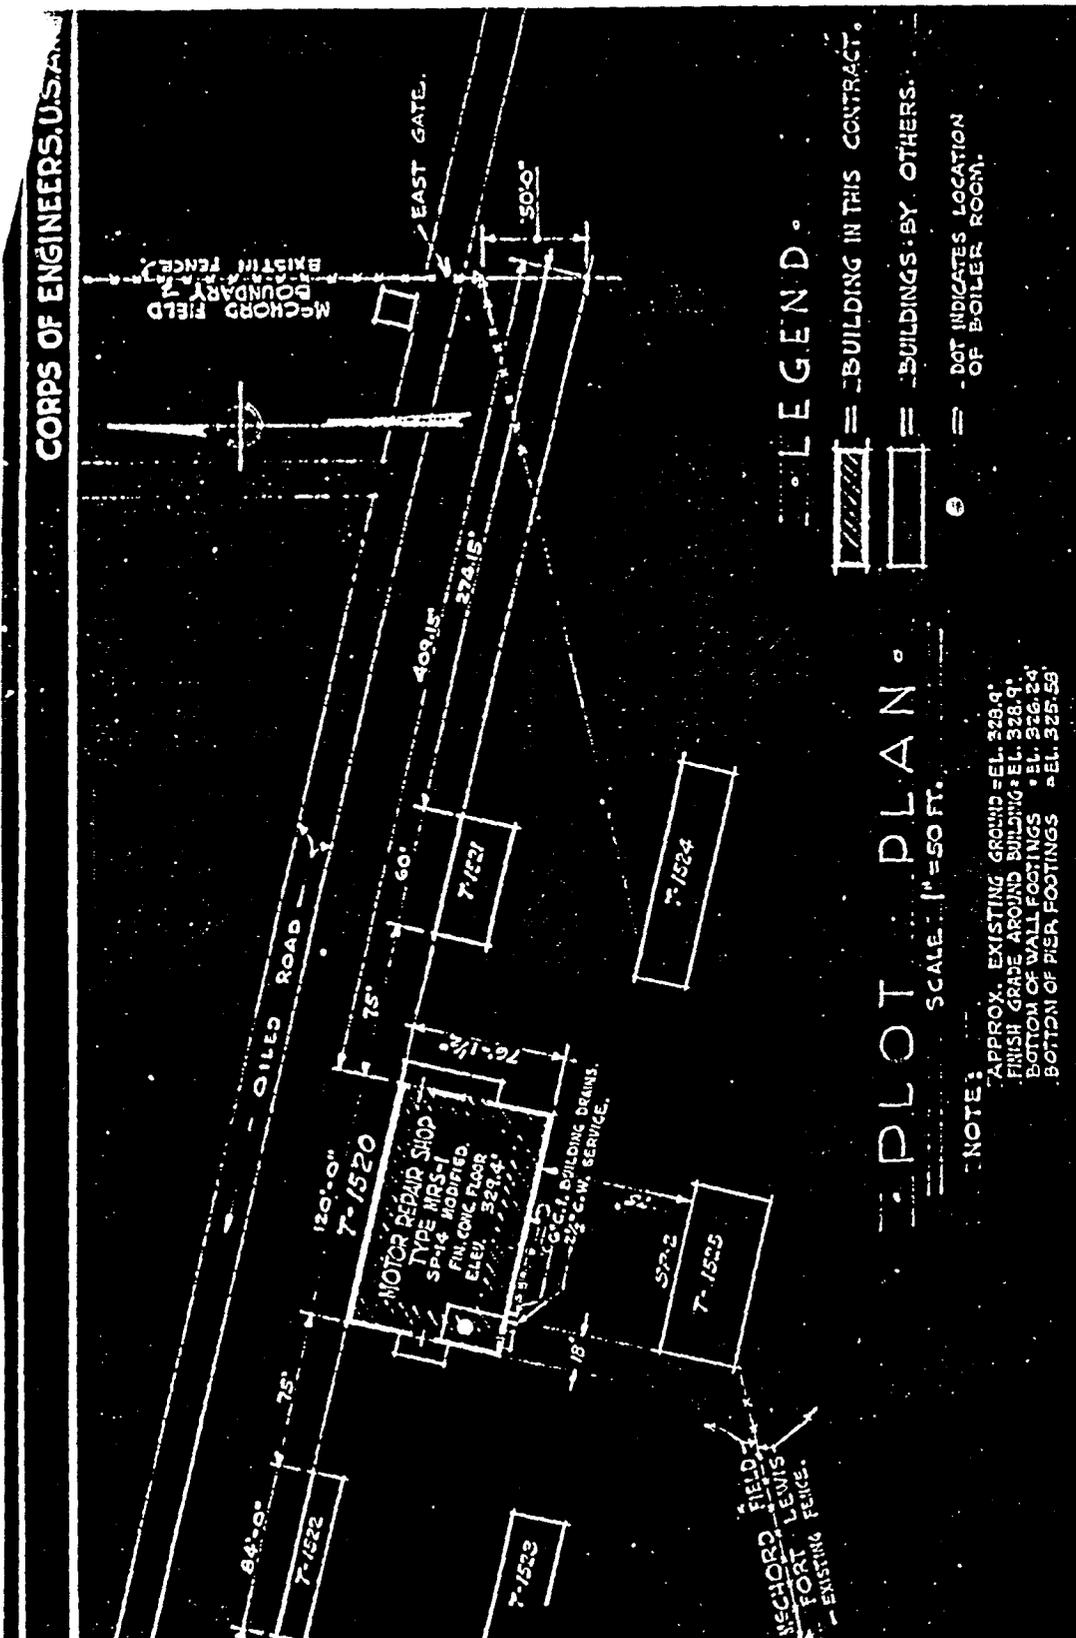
Detail from construction drawings shows proposed location of Building 724 on east side of McChord Field. (Plan N-6F-178.1 Motor Repair Shop, Type MRS-1, Type S9-14 Modified, McChord Field, Washington.)
